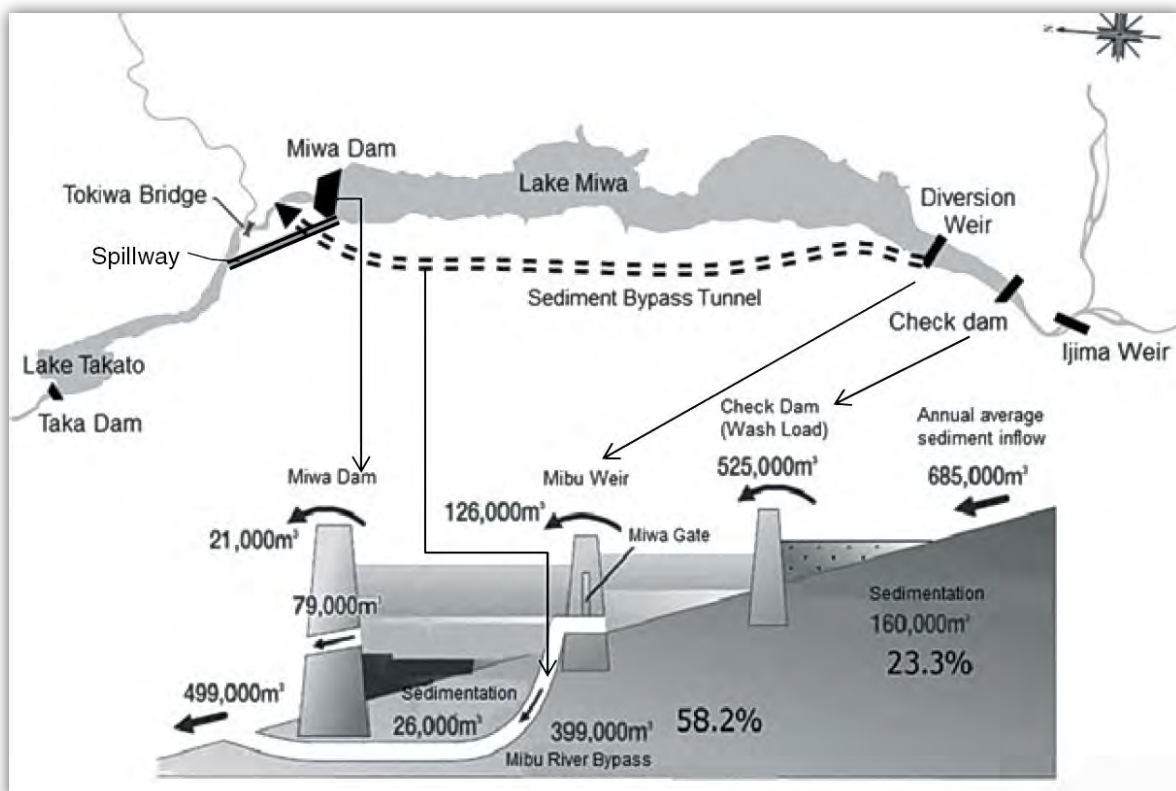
Sediment trapping and bypass system at Miwa Dam, Japan
